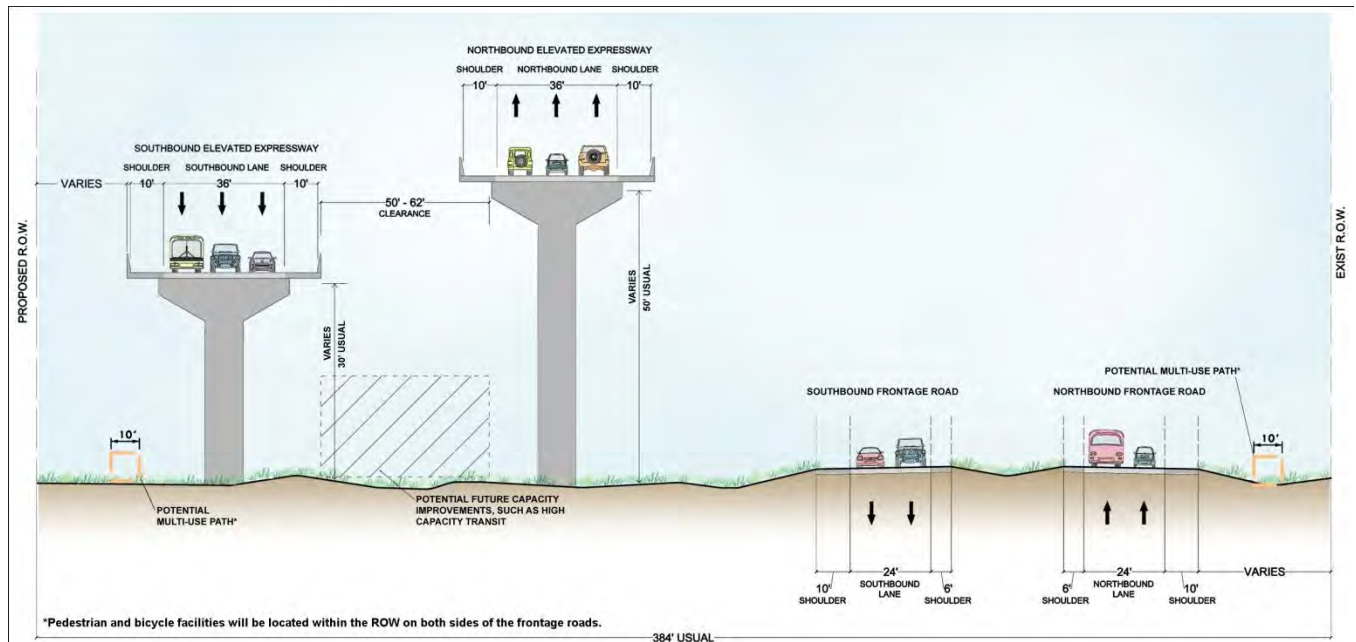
Elevated Expressway Alternative typical section (north of Stone Oak Parkway)
